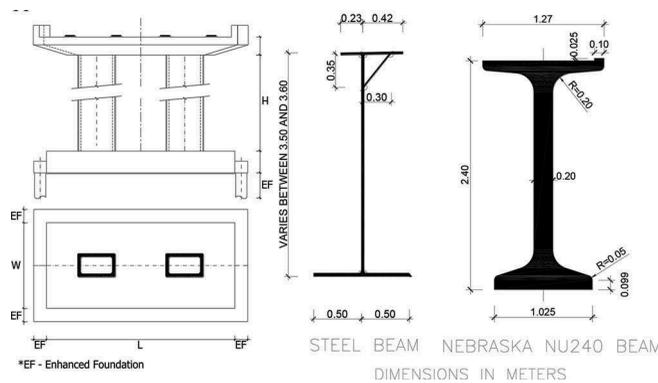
Schematic representation of bridge supports, and upper deck beams.
